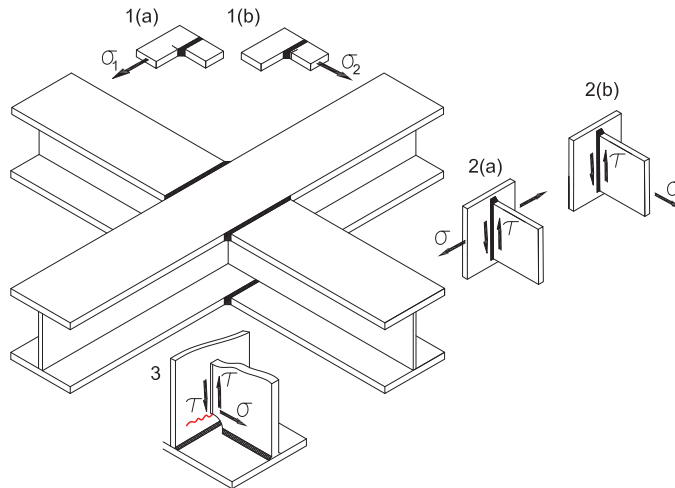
Typical bridge deck grillage connection with the different details composing it
